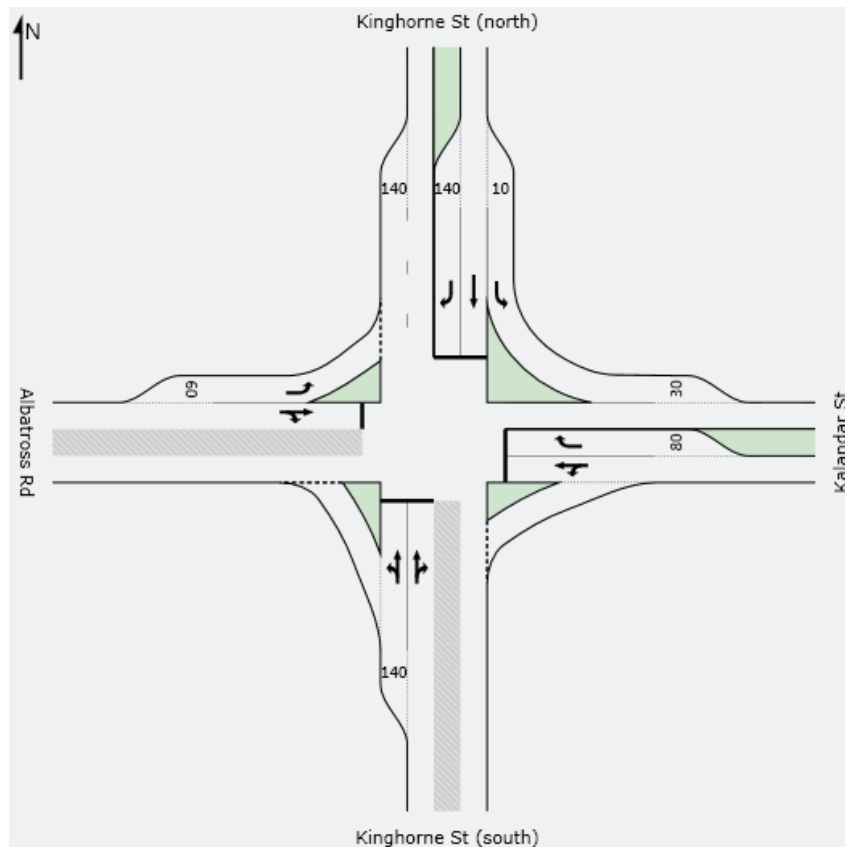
Albatross Road / Kinghorne Street Proposed Intersection Configuration
